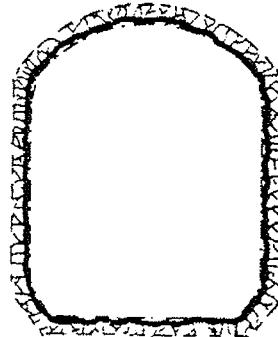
Crack zone from smooth blasting with Gurit 17×500 mm.
